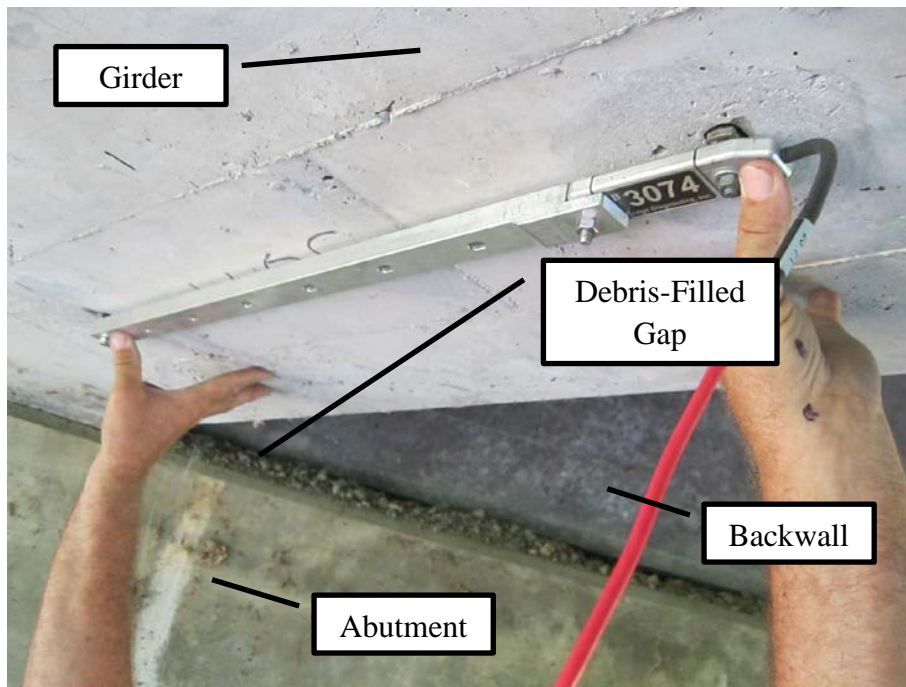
Condition of Gap Between Abutment and Backwall – Bridge 5109
